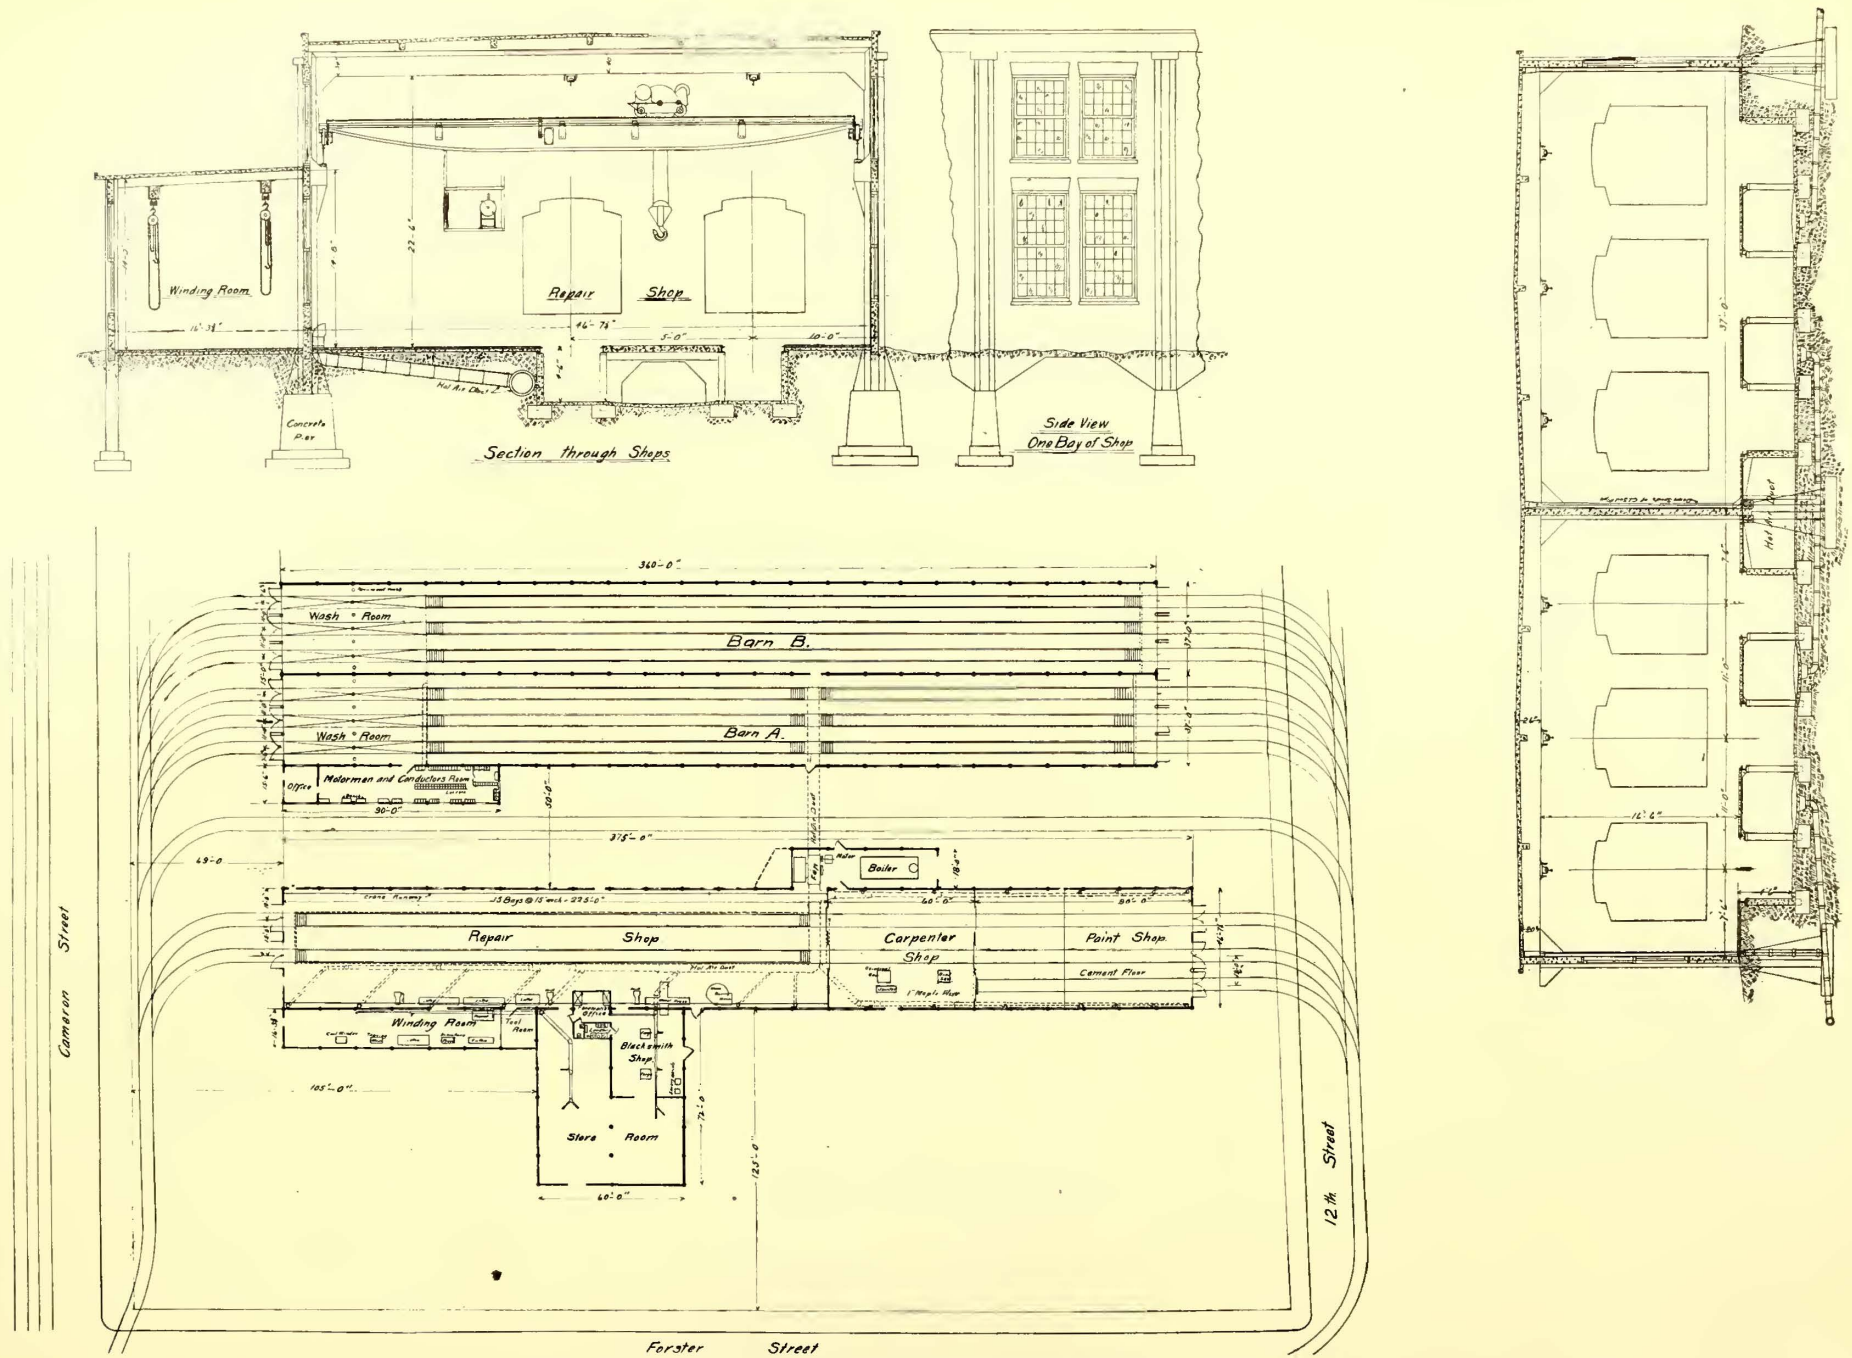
PLAN AND SECTIONS OF THE CENTRAL PENNSYLVANIA TRACTION COMPANY'S NEW SHOPS AND CAR HOUSES
